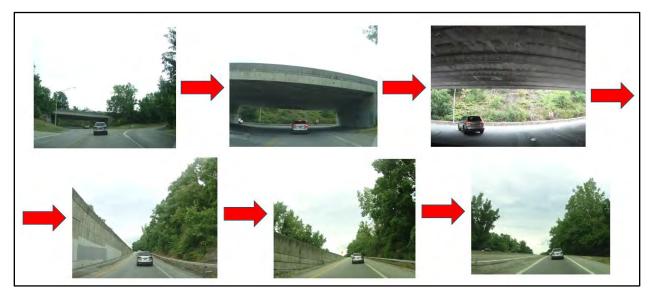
Louisa Road at Under Pass Onto U.S. 9
